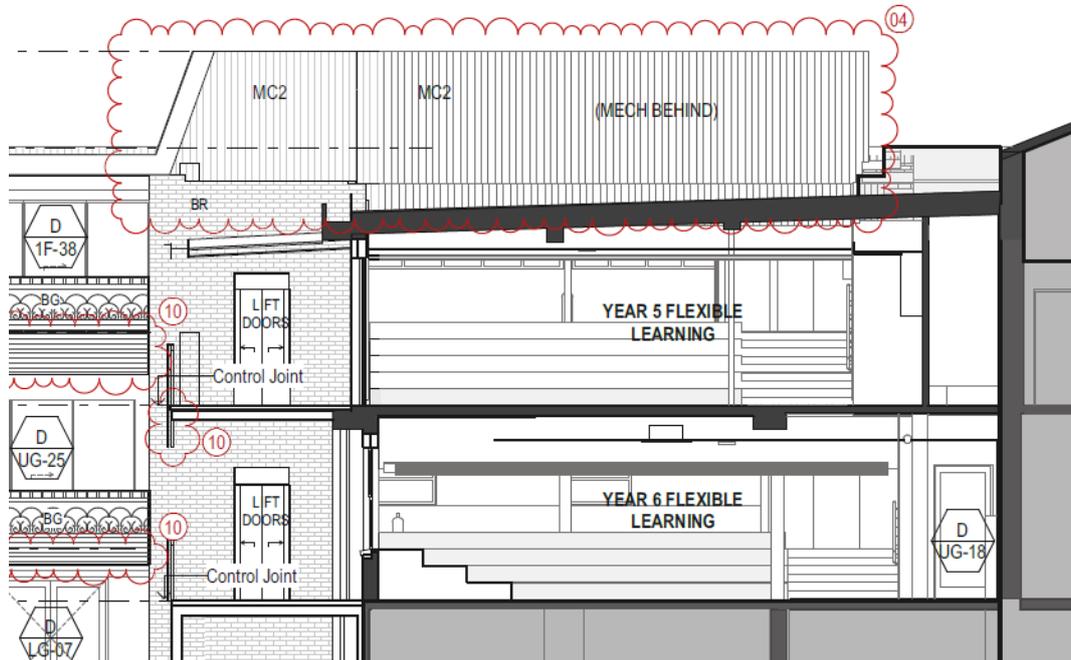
Proposed mechanical equipment screening – extract from east elevation
